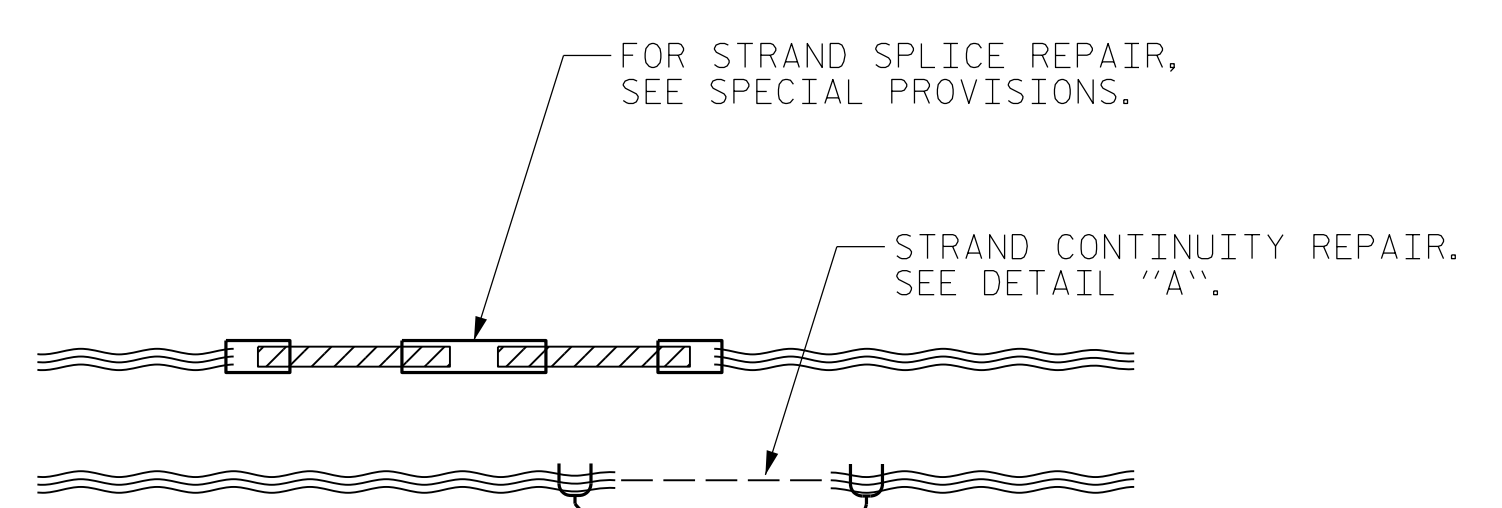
TYPICAL CONTINUITY TESTING AND CORRECTION ZONE
